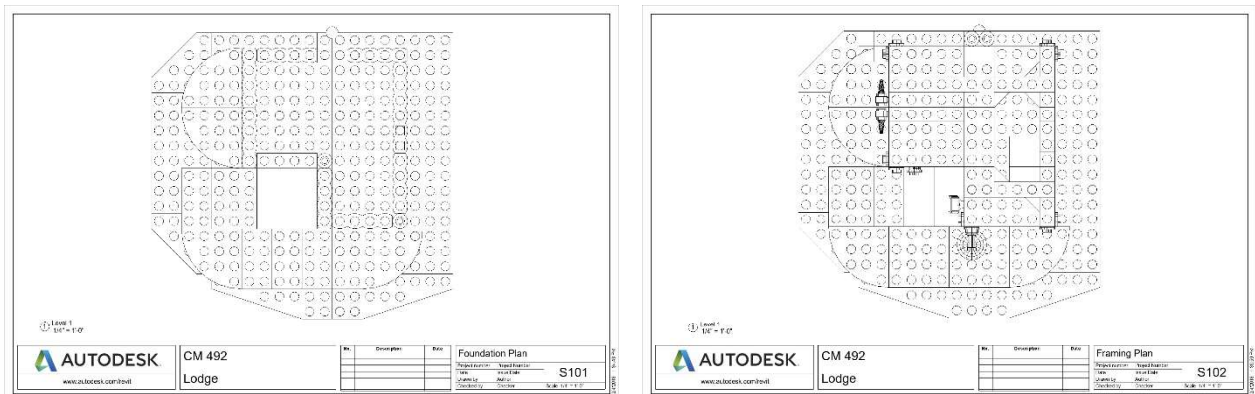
Foundation Plan and Framing Plan of the Lakeside Lodge from Revit
